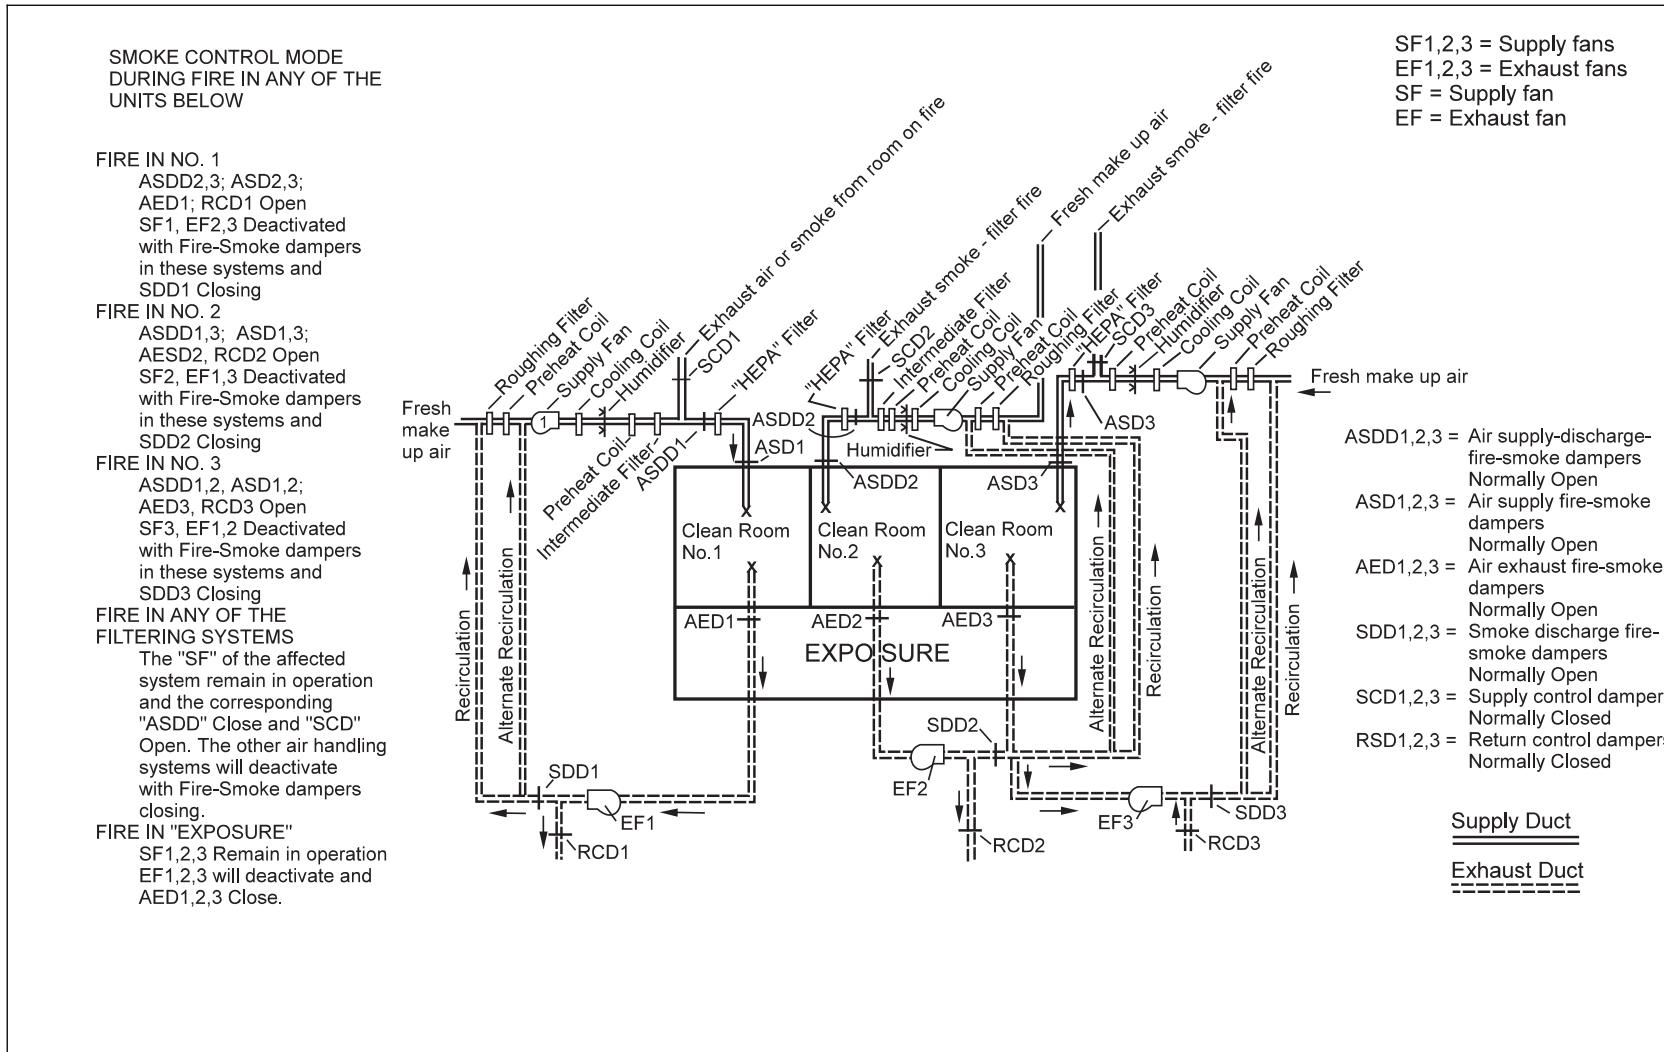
Typical smoke control arrangement when an individual air handling system serves each room.
